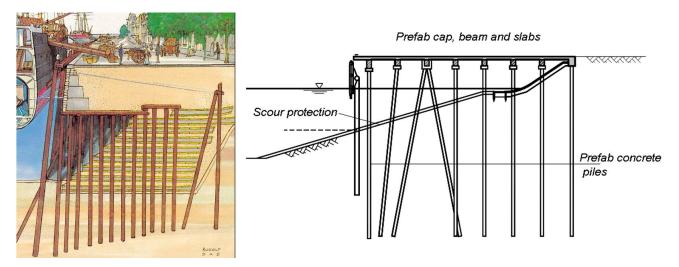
Composite soil retaining structures; Gravity wall and piles (left), platform, piles and slope (right) (source unknown)
